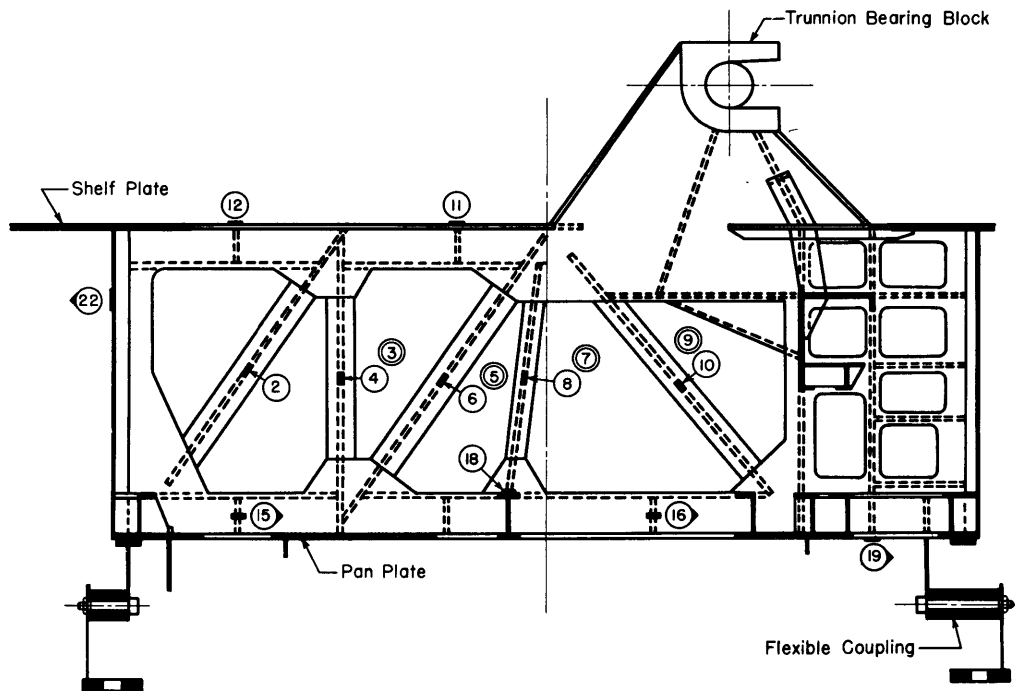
Elevation of Port Truss, Showing Locations of Metaelectric Strain Gages
